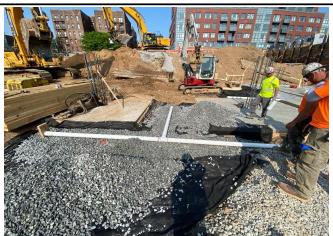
Imported crushed quarried stone, view facing southwest.
